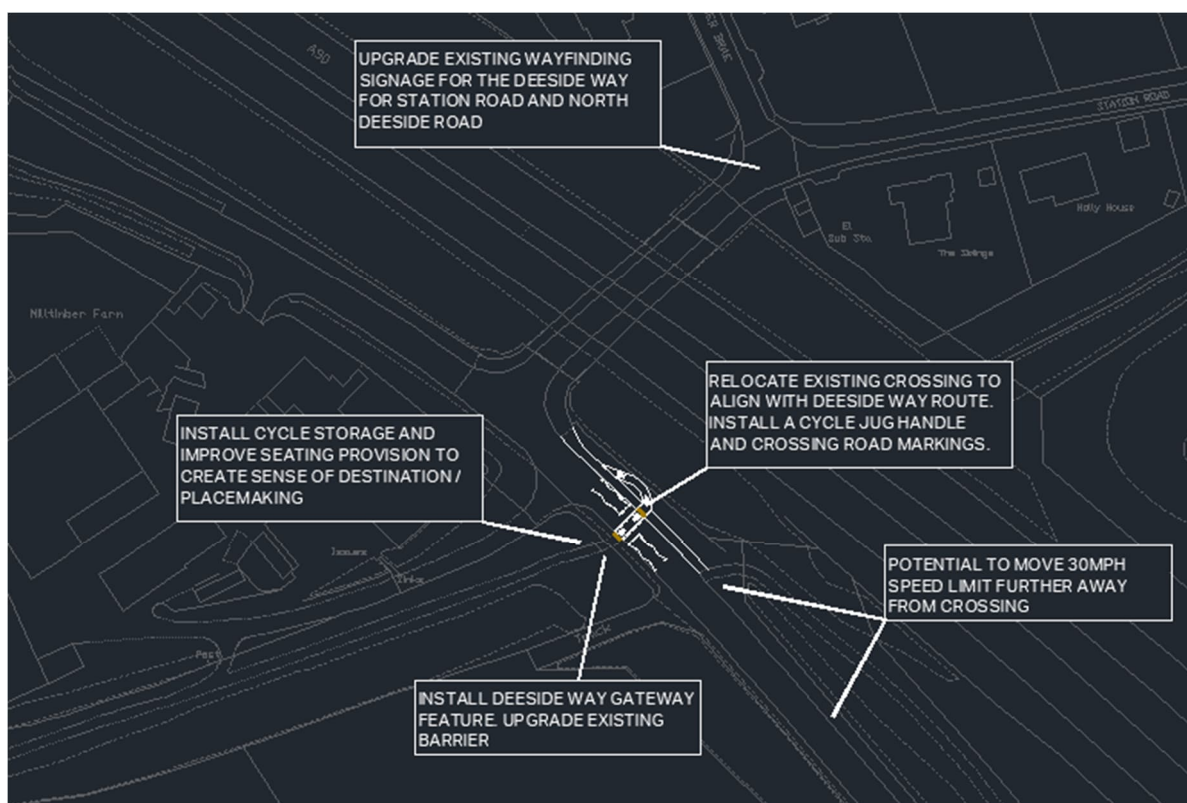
Deeside Way at Milltimber Brae - Proposed Improvements
